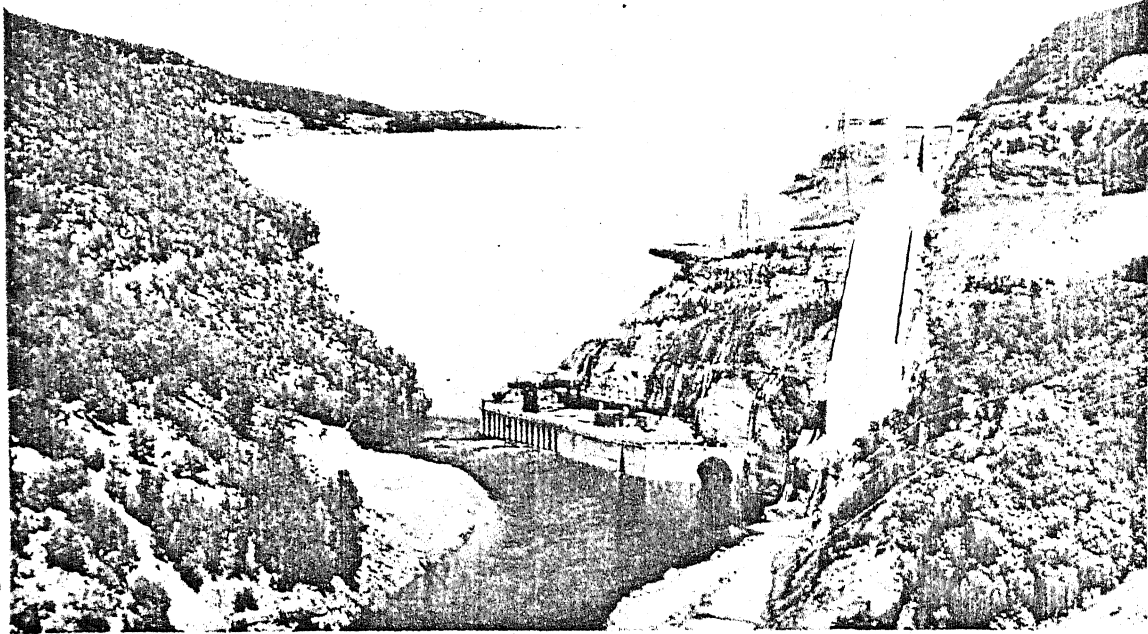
View of Kremasta dam; leakage on left abutment over power house.
